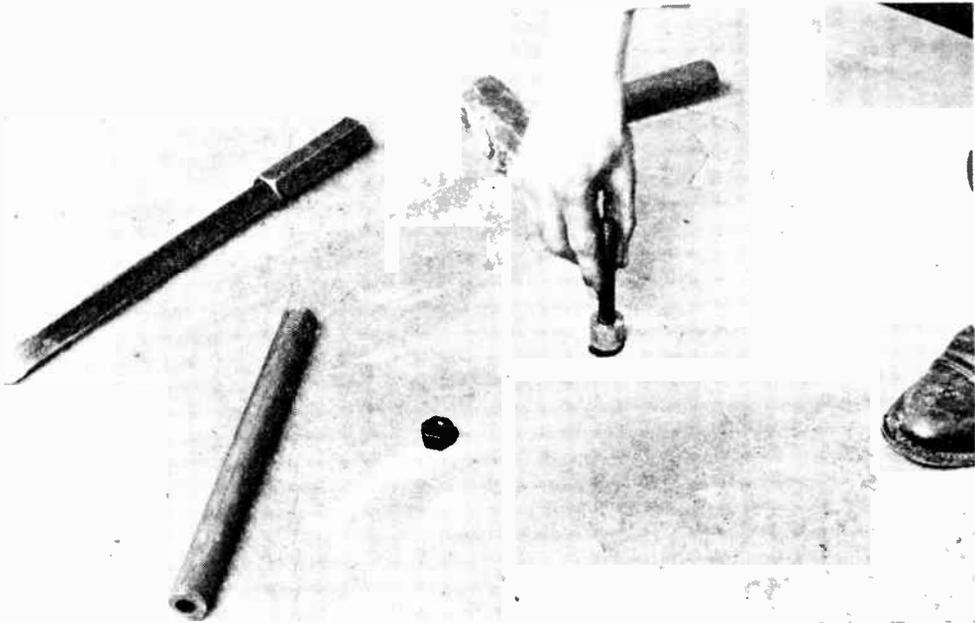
How to Fix Heavy Machinery to a Concrete Floor (2).
